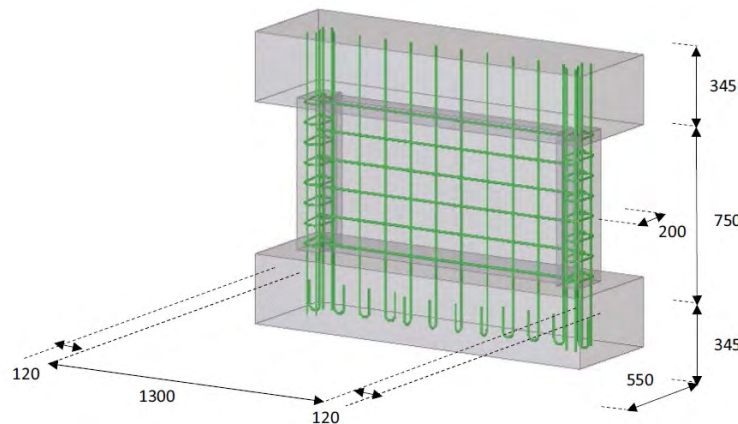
Geometry and reinforcement of shear wall specimen; Orbovic et al. (2015)
